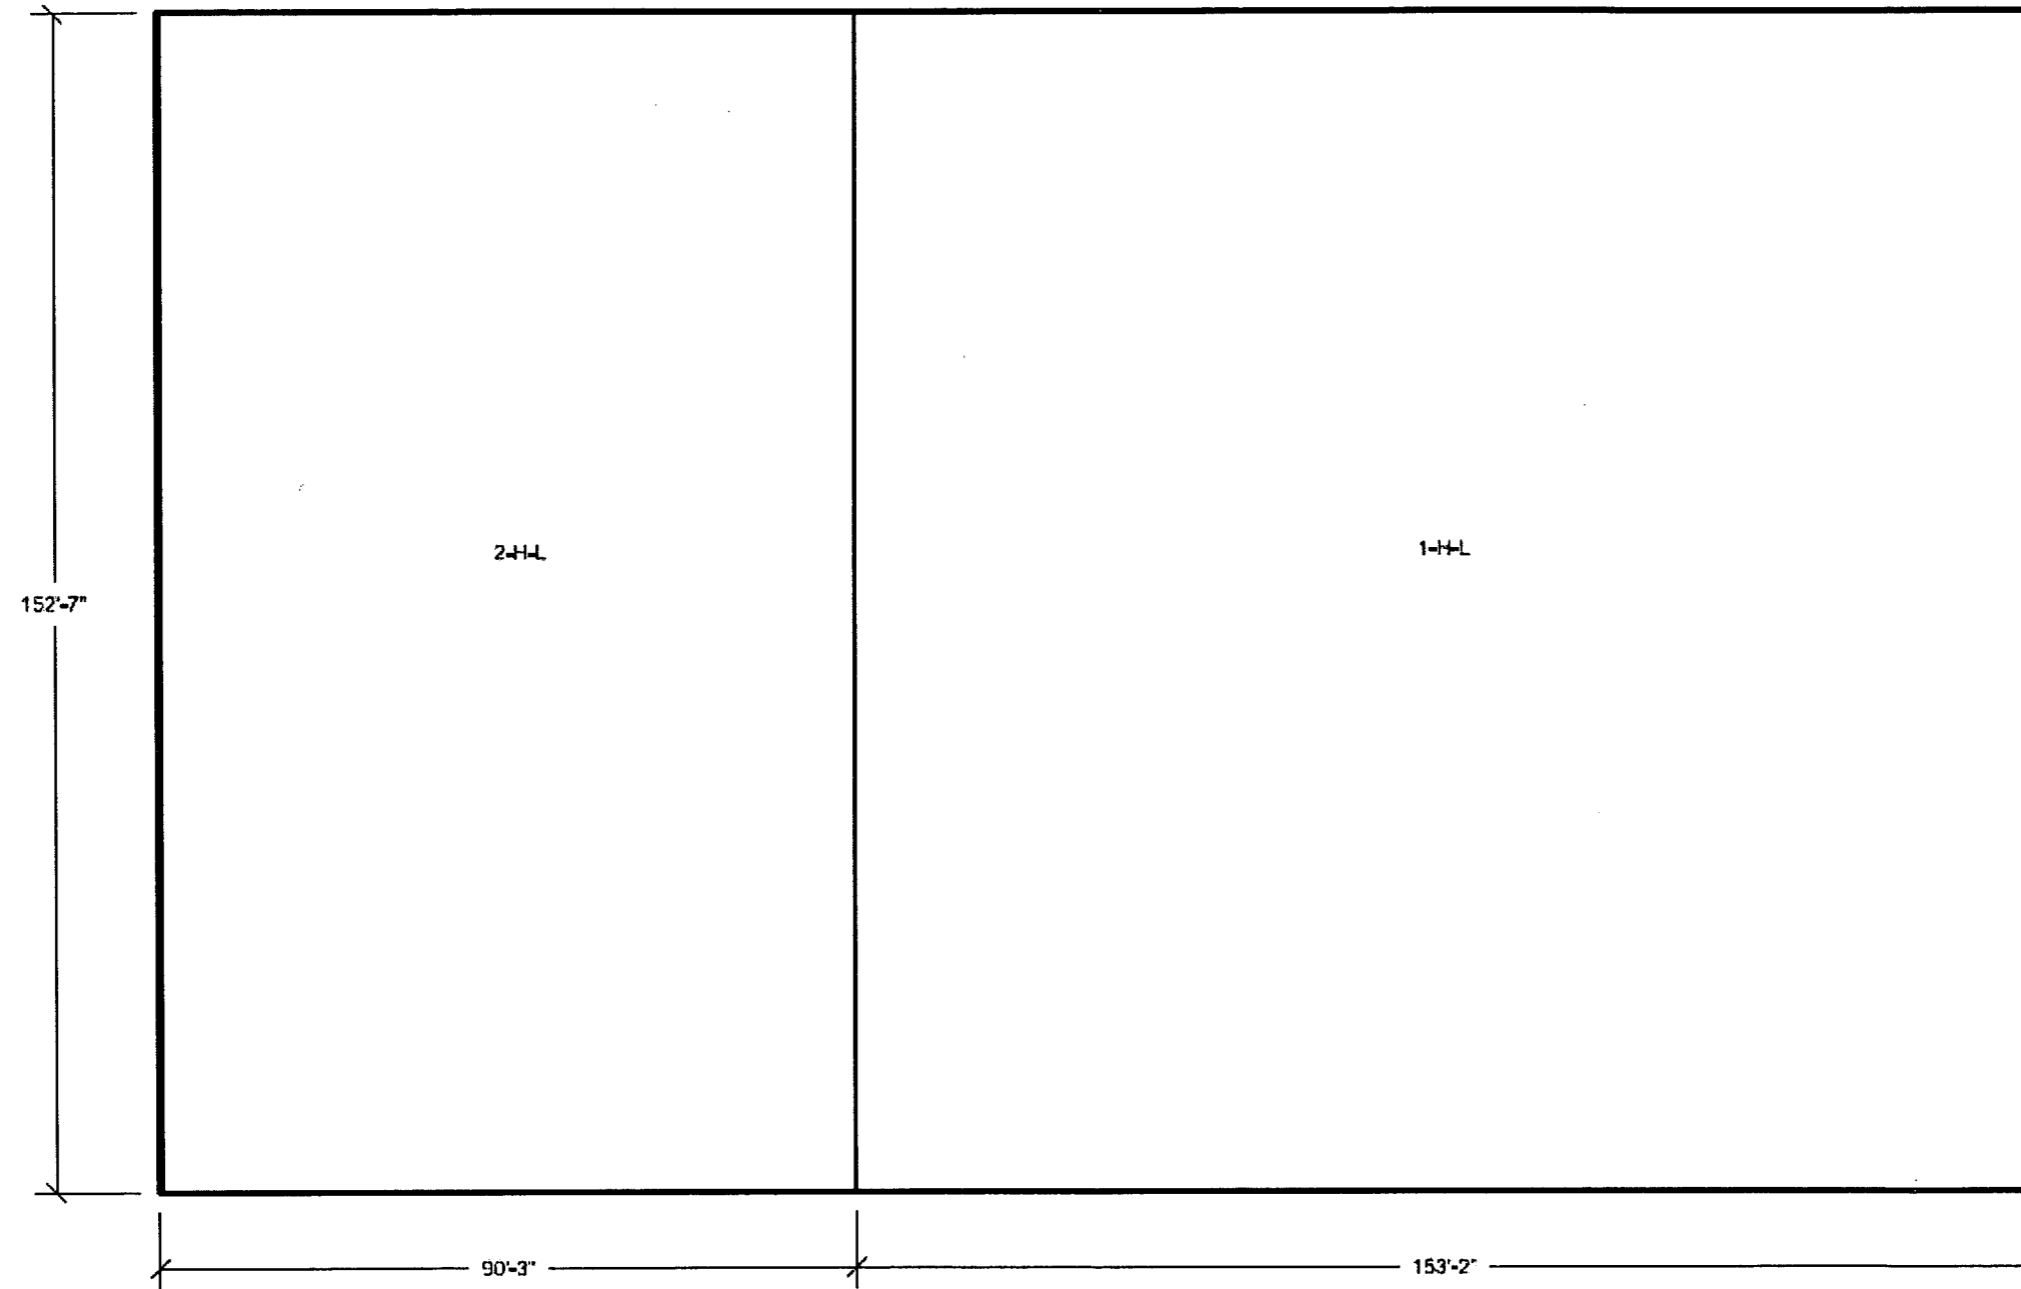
H.3-28: BASEMAT LOOKING DOWN
